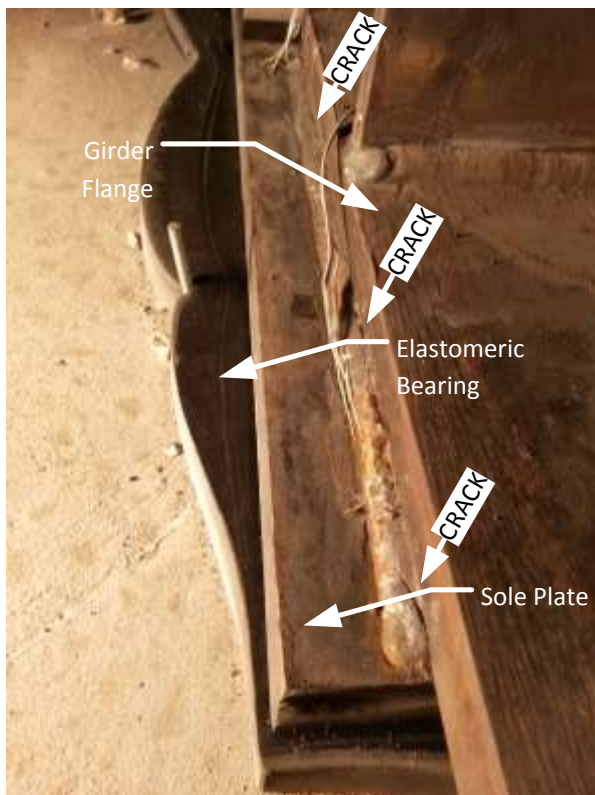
Failed Weld on East Side of North Girder
